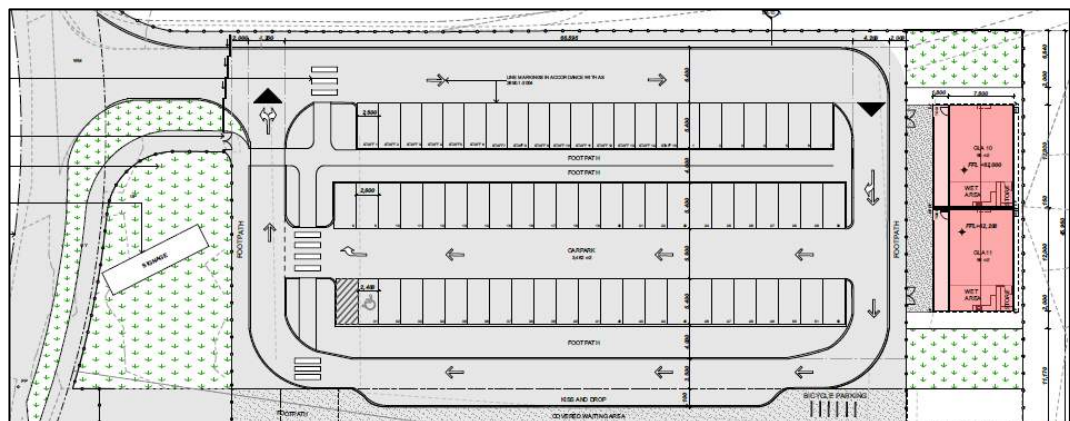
Existing parking layout (67 car spaces) (DA-456/2016) (Sources: JDH Architects & Bitzios)
